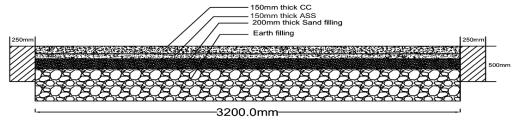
Sample design cross section of roads (BC and RCC) at Gopalganj Pourashava
